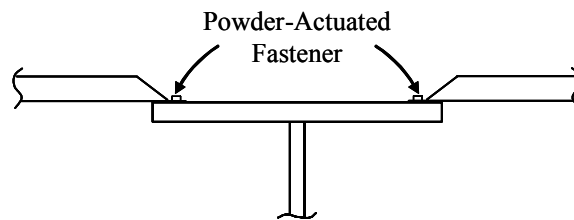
METAL DECK ATTACHMENT DETAILS
